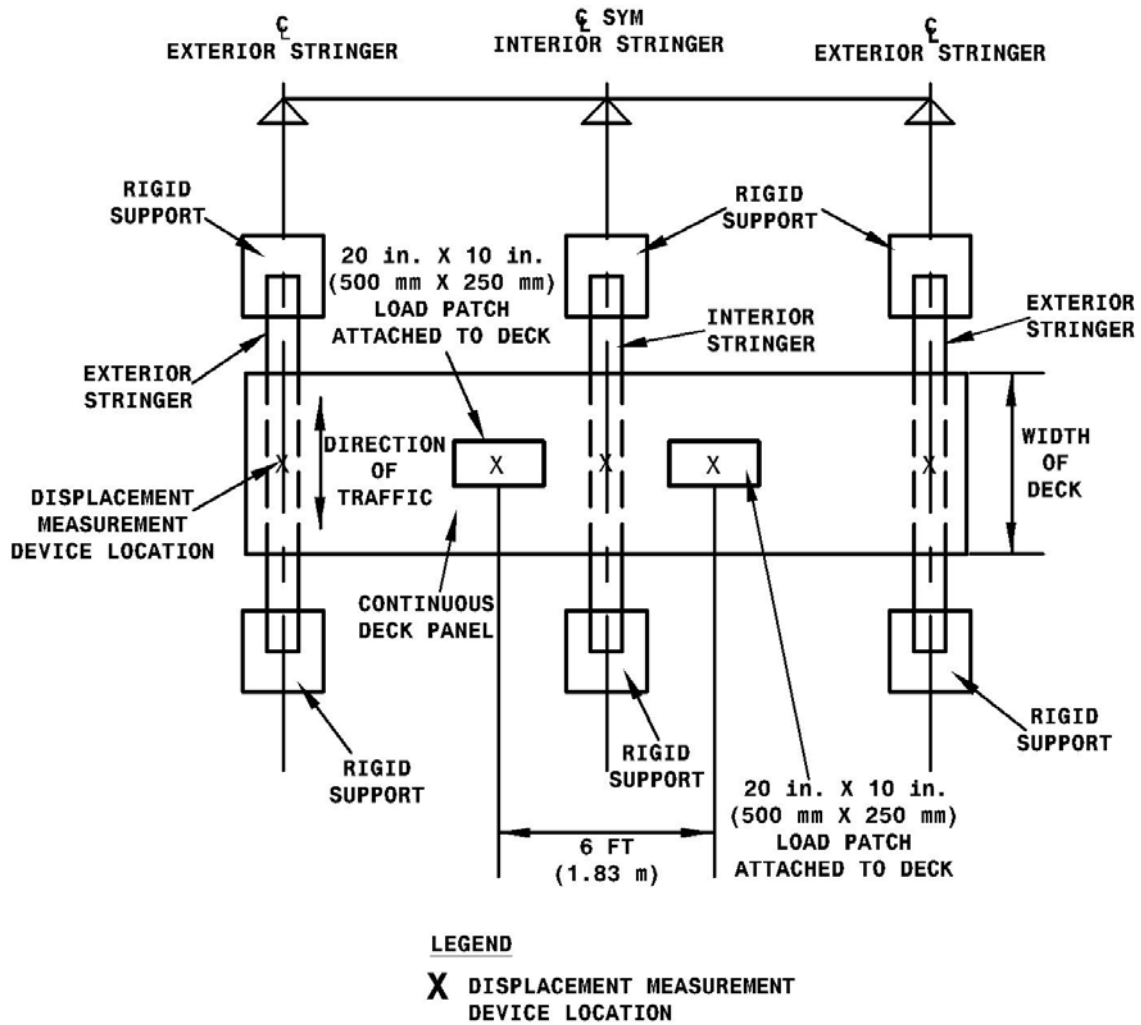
Minimum Instrumentation Required for Deck-to-Superstructure Connection Cyclic Test
